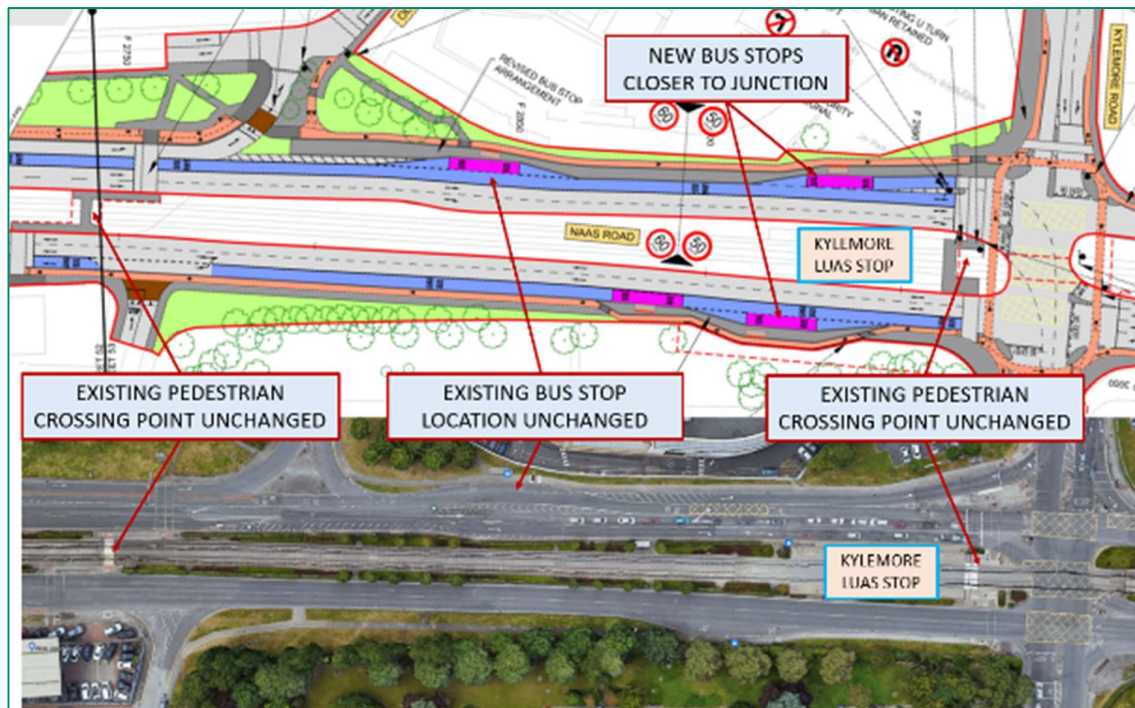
Extract of General Arrangement for the Proposed Scheme and Existing layout
